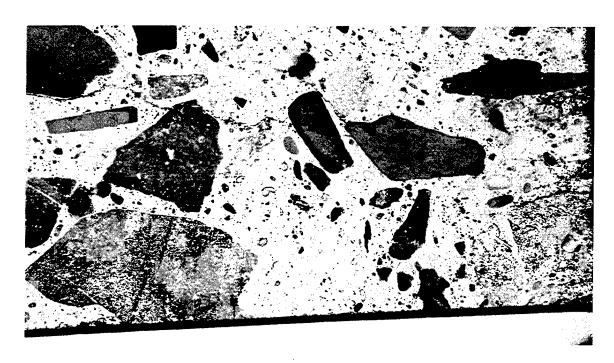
Sample 950628 shows severe cracking in near surface concrete. Epoxy resin fills the cracks. Top sample is 6 in. (152 mm) left to right
